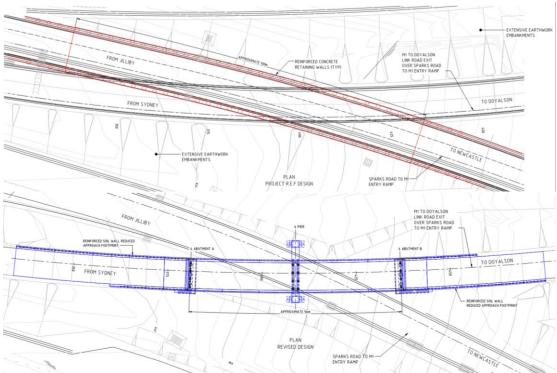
Comparison of the Doyalson Link Road Bridge over the M1 entry ramp under the original Project REF (above) and the Proposal (below)
